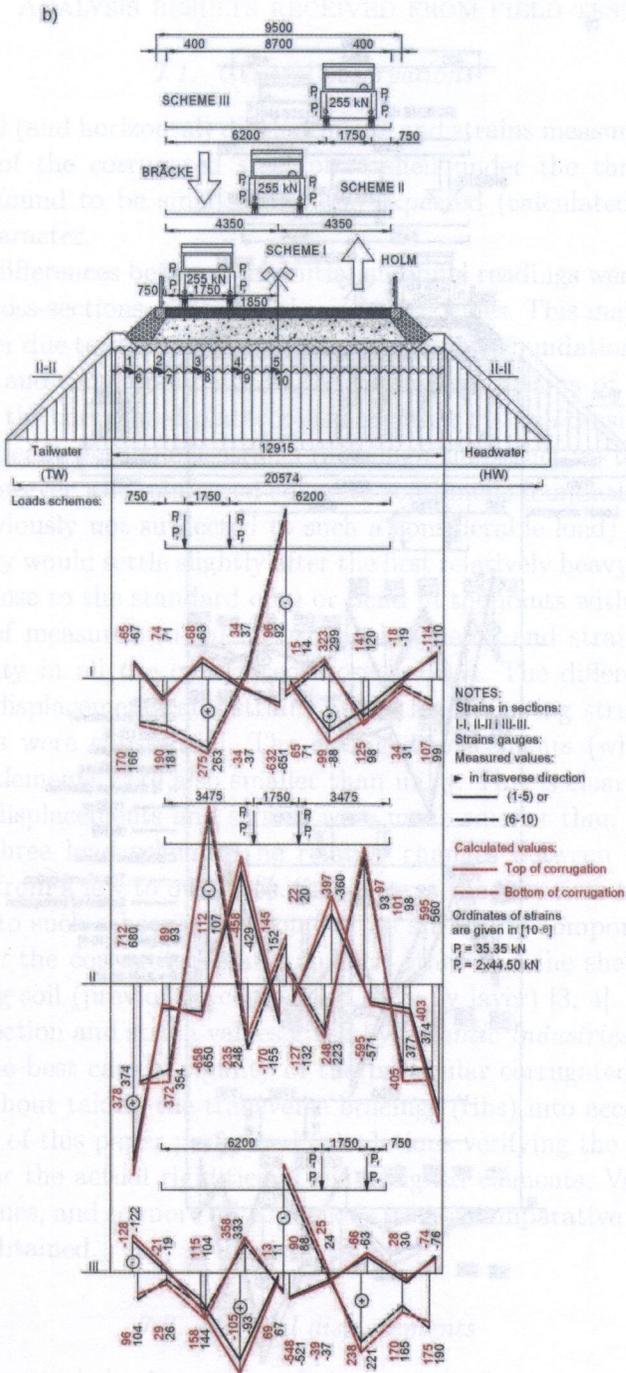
Graphs of maximum strains in selected points (gauges no. 1-20 in longitudinal direction) of steel shell structure in cross-sections of the span: b) II-II.
